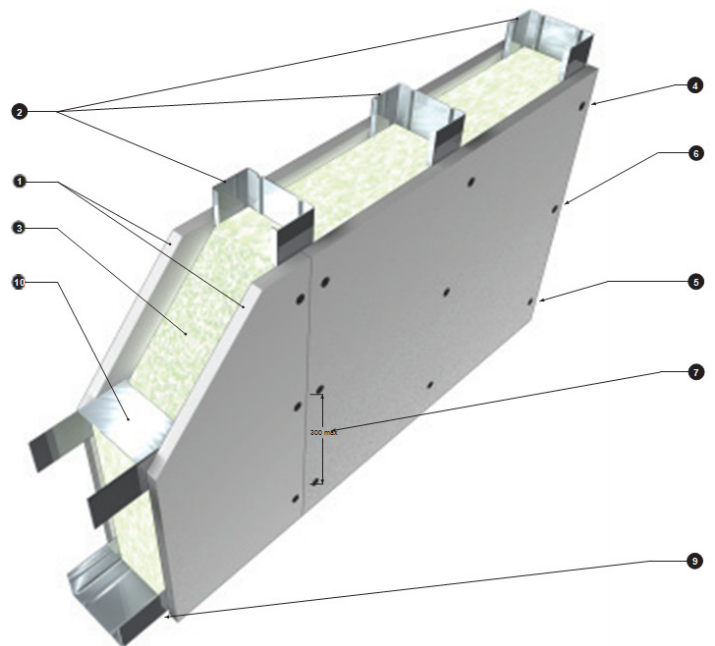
Steel Fire Wall Single Board Each Side
